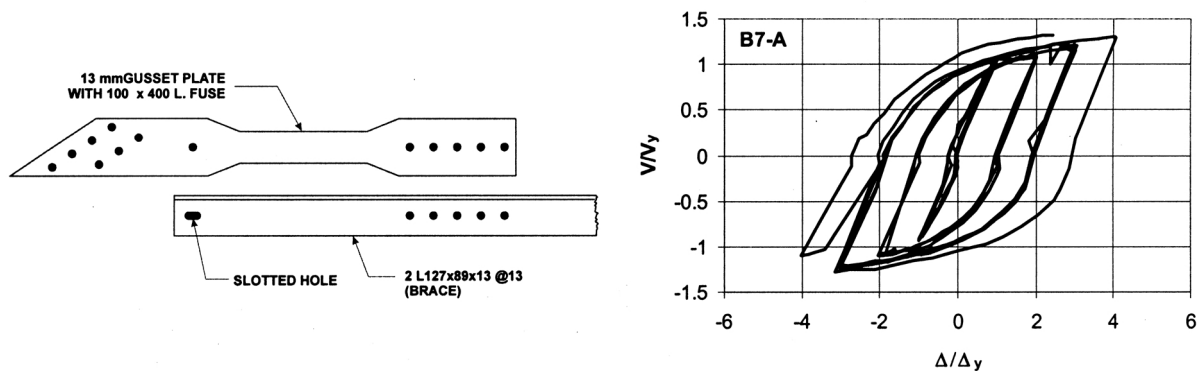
Brace fuse detail (Tremblay and Bouatay (1999)).
